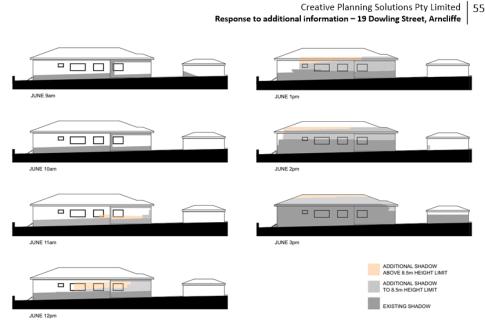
Submitted elevation shadow diagrams showing extent of existing and proposed shadows, along with the difference of a building with a compliant building height and that proposed under the latest amendment to the plans.
